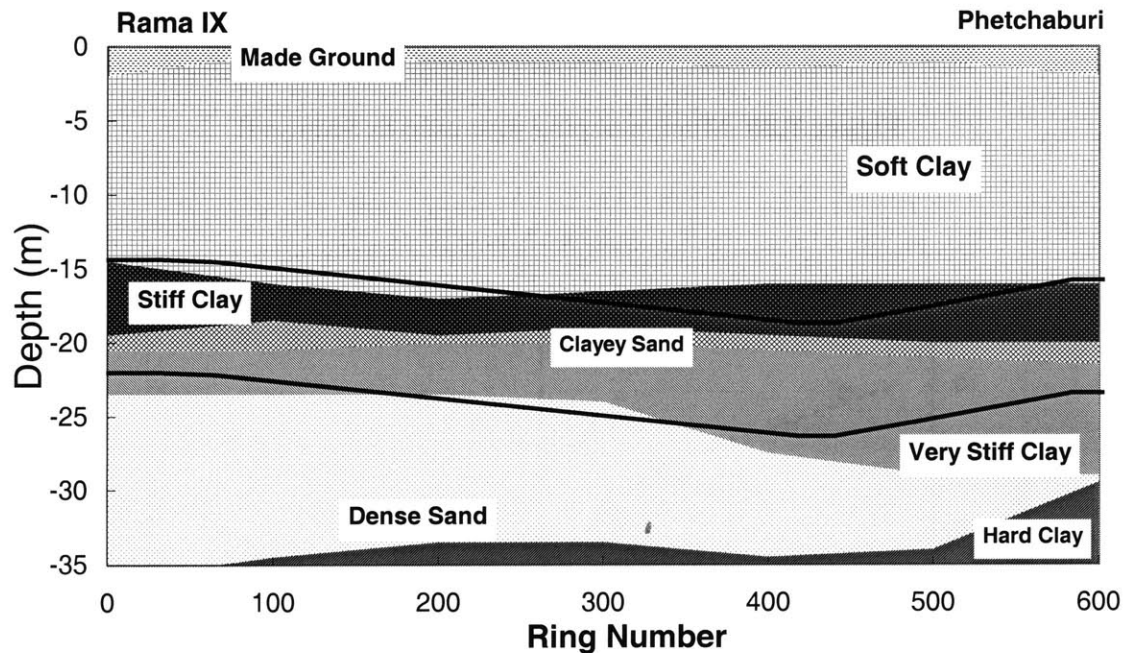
Subsurface conditions of tunneling section (northbound) between Rama IX and Phetchaburi stations (Section C)
